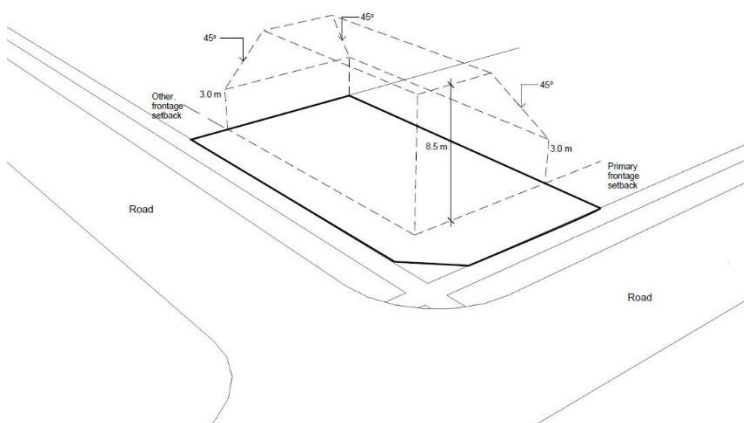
Building envelope for corner lots as required by clause 10.4.2 A3(a)
